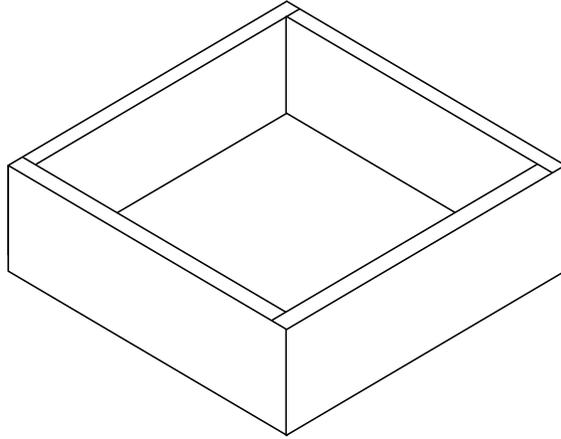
drawings depict an inside corner fabrication, A - represents the flashing piece cut and folded to the dimensions as determined in Illustration 10. The piece could be either Illus.10- B, First flashing piece (narrower piece), or Illus. 10-D the Final flashing piece (wider piece). It is easier to fabricate and install fabricated corner flashing pieces when they are shorter in length. Use lengths of 1 to 2 feet maximum.
